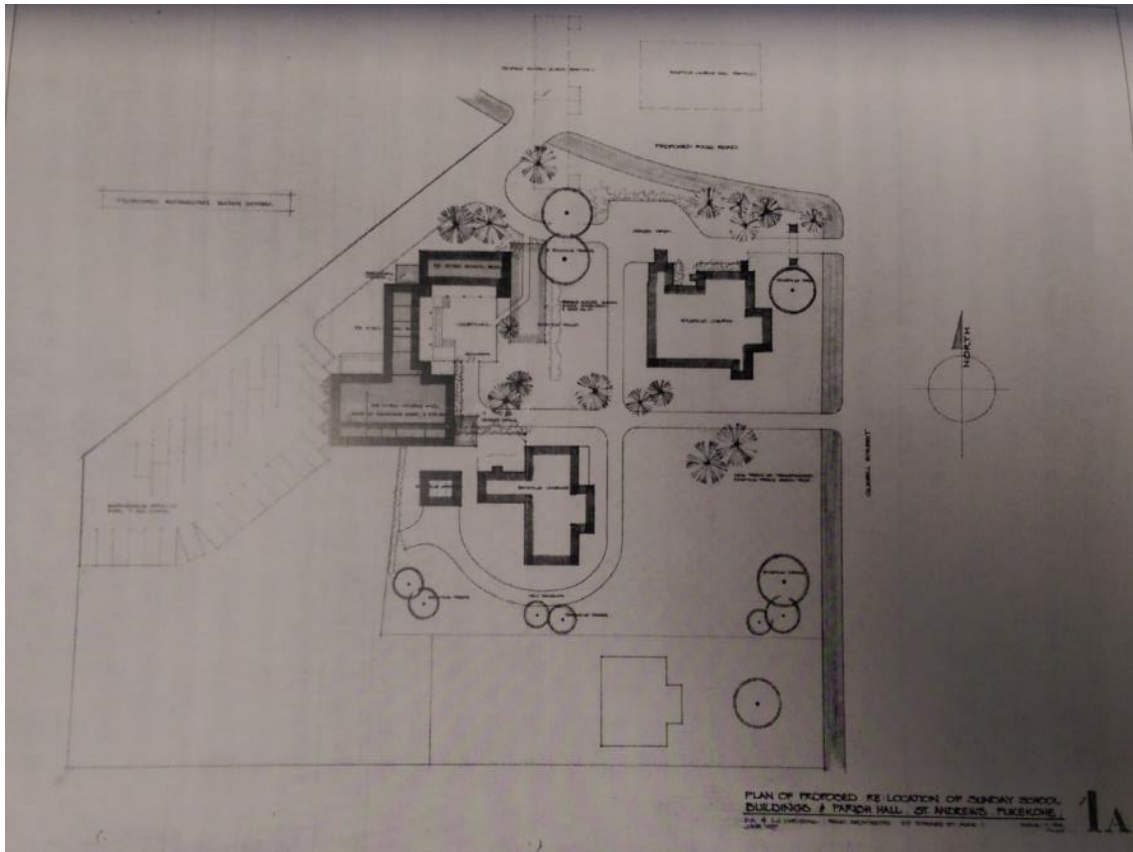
Site plan showing the proposed Sunday school complex to the west of the church, which comprises the parish hall and Sunday school hall, 1977 (Auckland Council property records).
